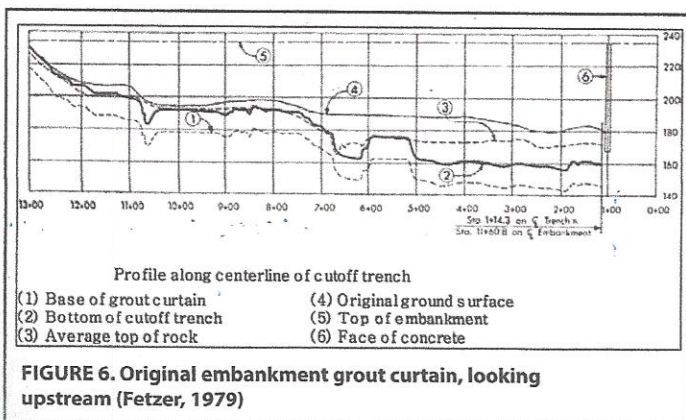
Original embankment grout curtain, looking upstream (Fetzer, 1979)
